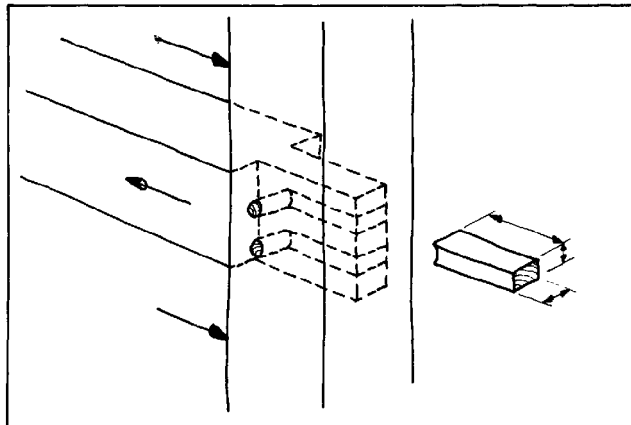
Figure E. A through mortice-and-tenon is used to join main beams loaded in tension. The strength of the joint is determined largely by the amount of wood behind the peg resisting in shear.
